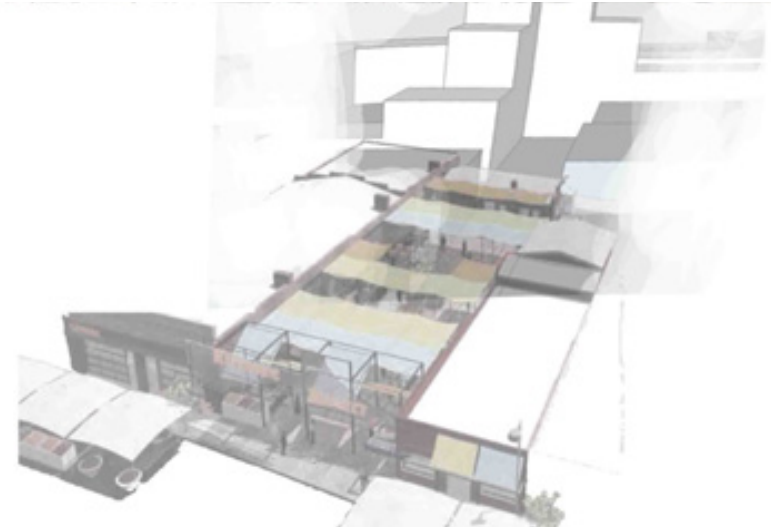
PROPOSED INFORMAL RETAIL TOWARDS ANCHOR POINT
